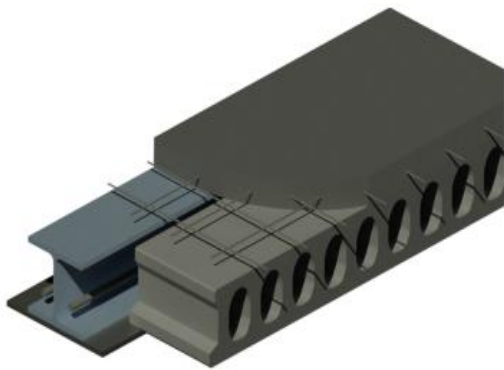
Slim Floor Beam with Hollow Core Slabs
